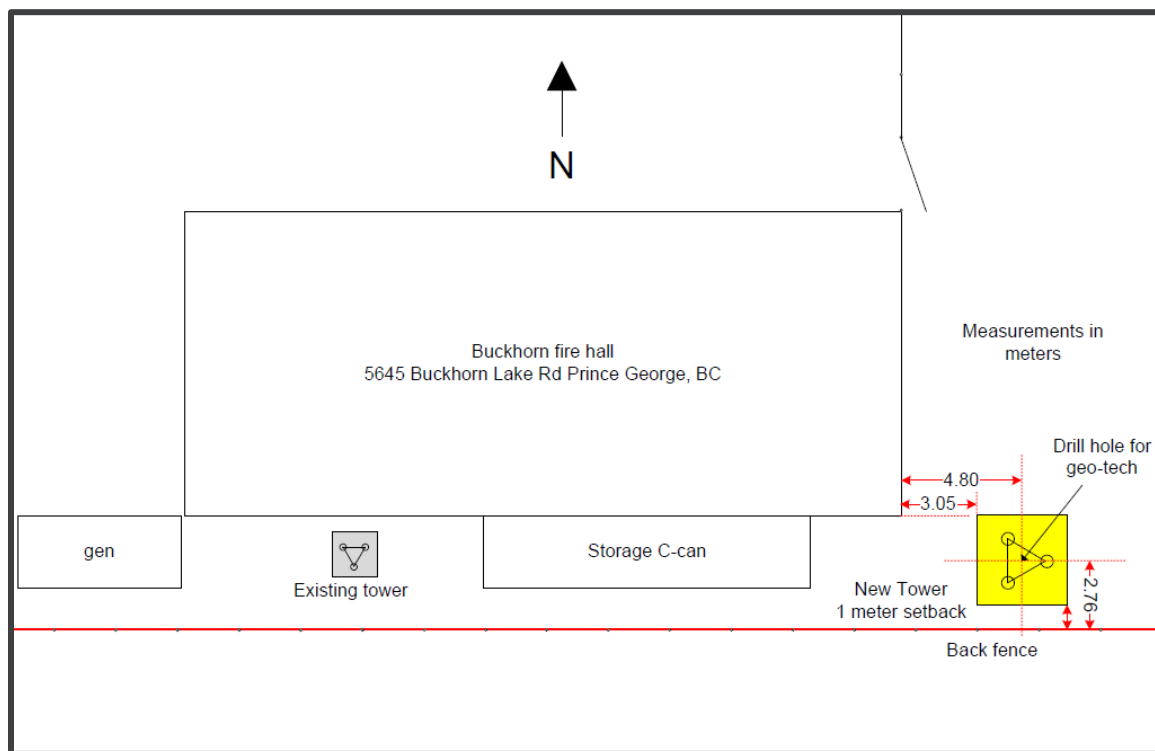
Site location plan showing location of proposed tower in relation to the Buckhorn Fire Hall Building.
